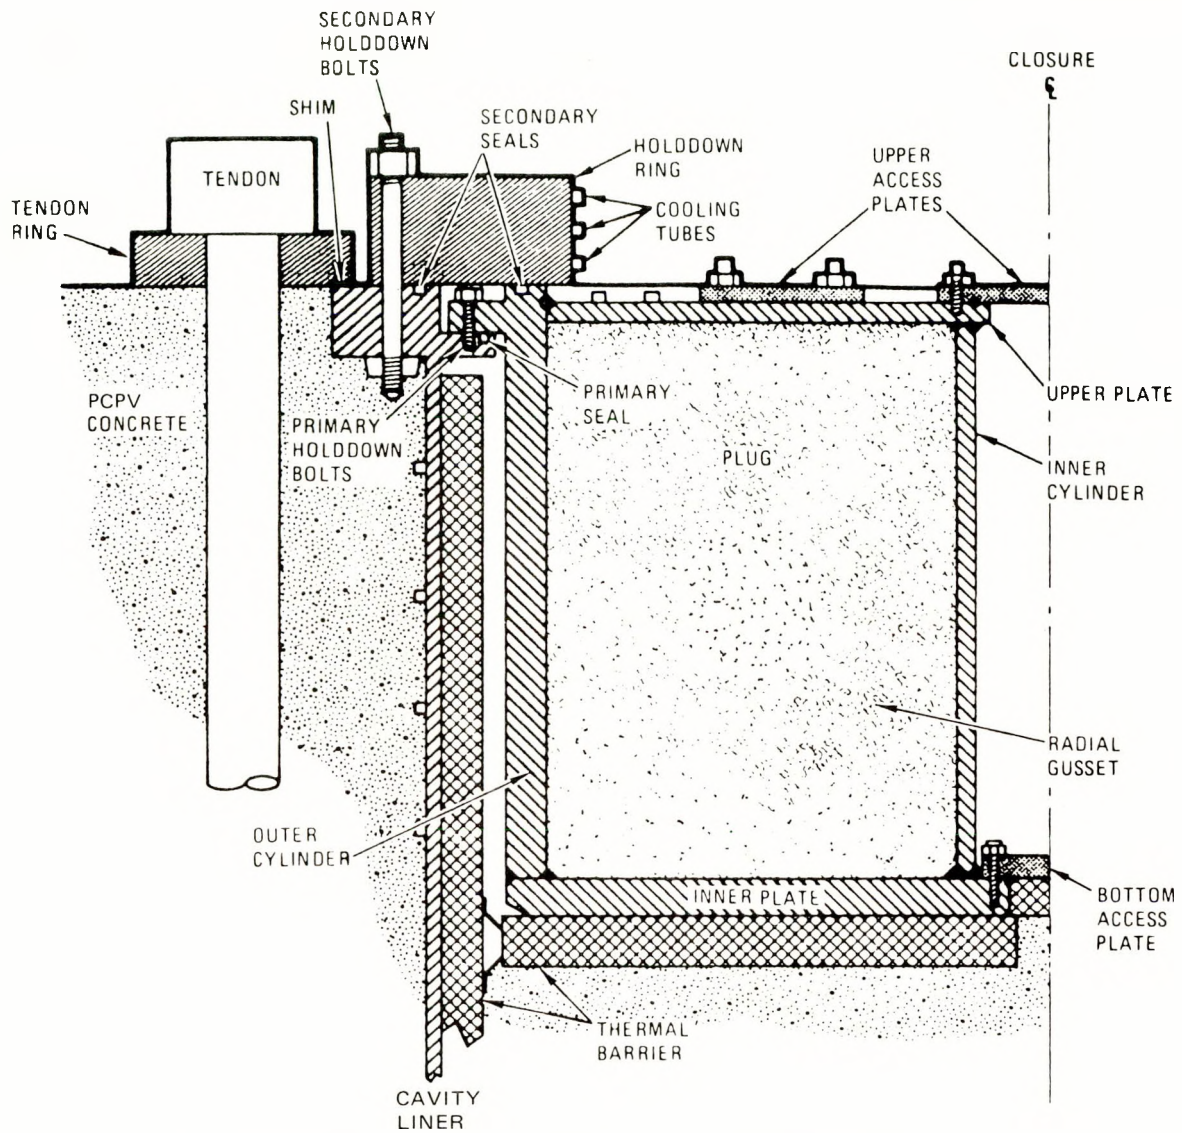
Steel PCPV closure plug with bolted flange.
